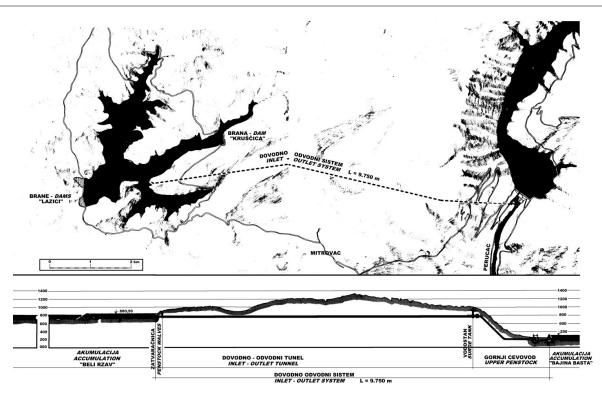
Upper and lower accummulation and inlet-outlet system of hydroelectrical power plant "BajinaBašta".
